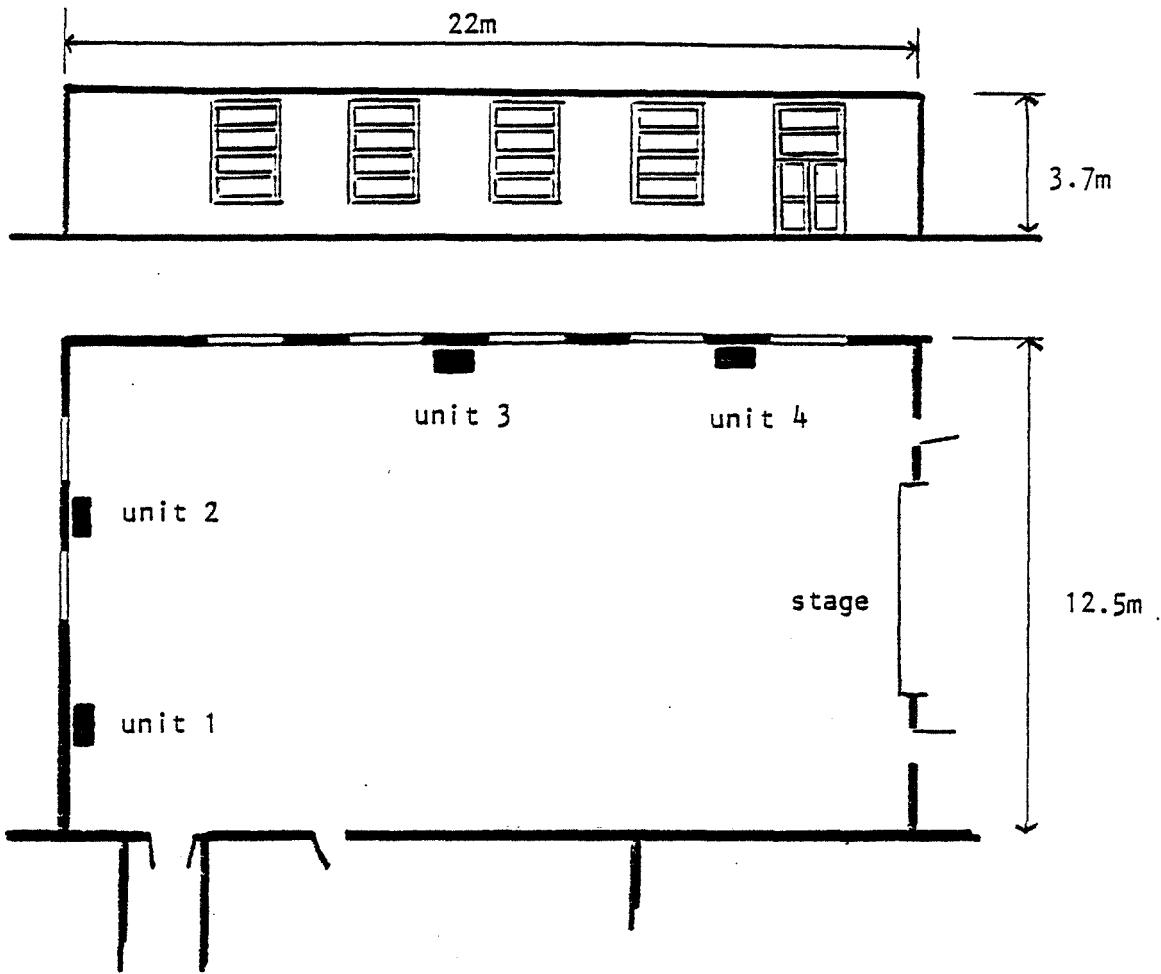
Plan and elevation of Club A showing location of four air conditioning units
